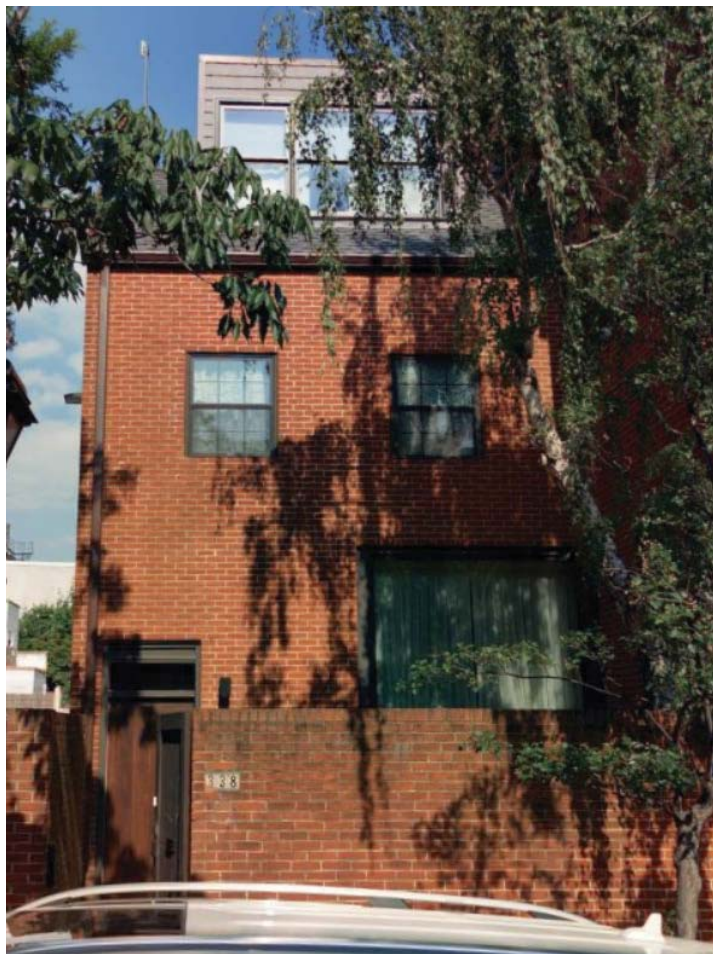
July 2017 photograph showing the cut down window openings and installation of double-hung vinyl windows with faux muntins at the second floor.
